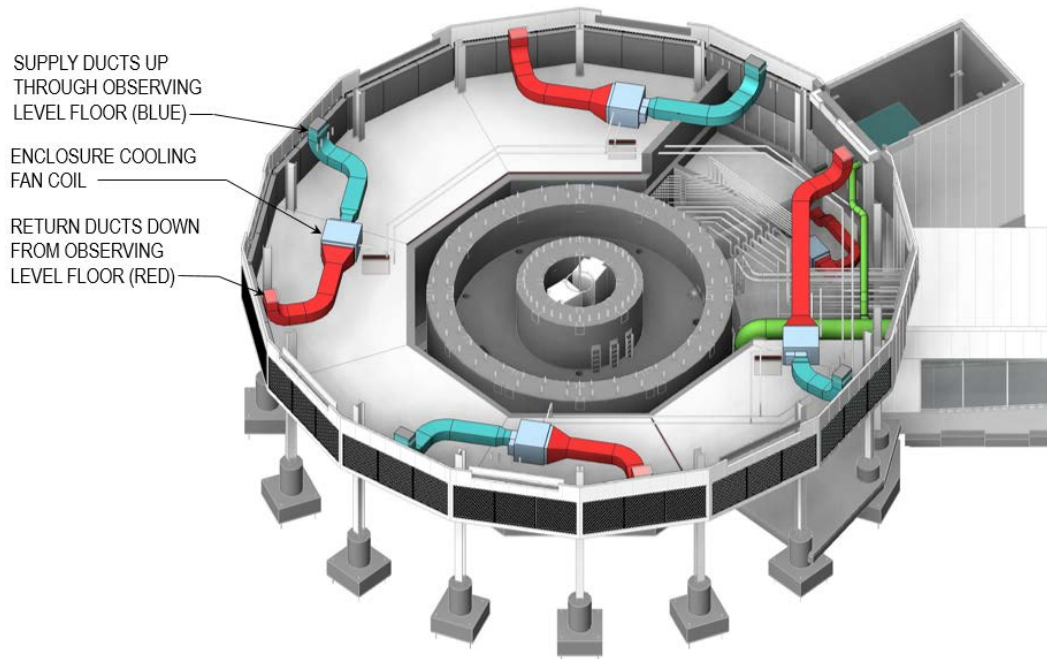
Enclosure Fan Coil Units Below Observing Floor
